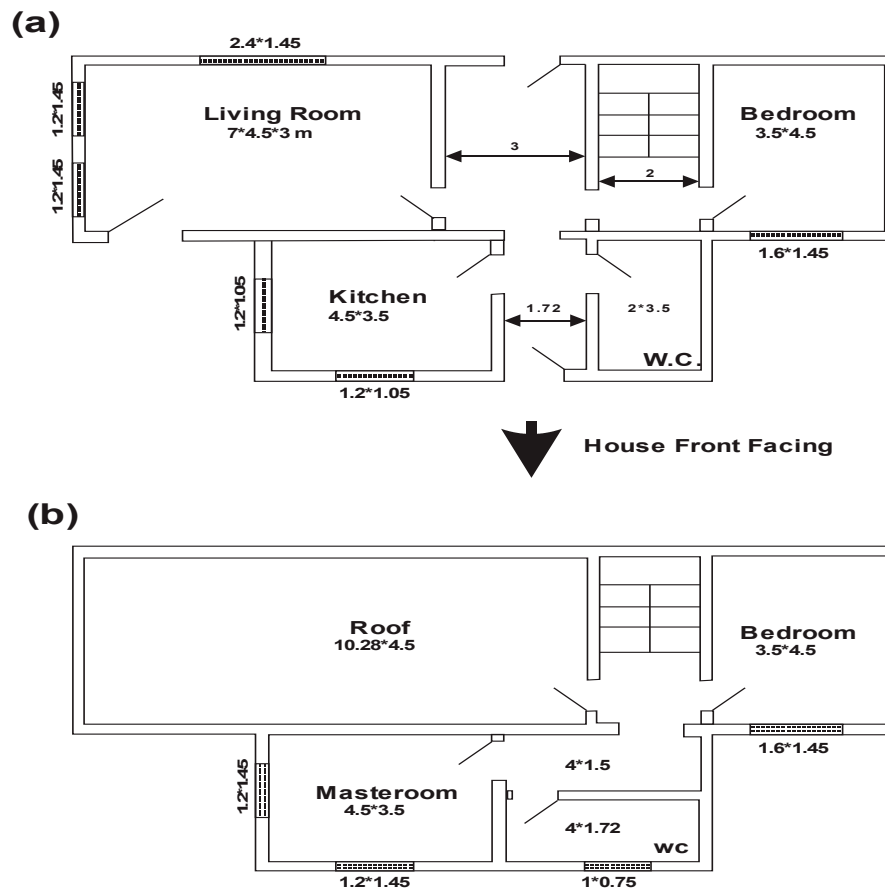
Layout diagram of the modern domestic solar house (a) ground floor (b) first floor.
